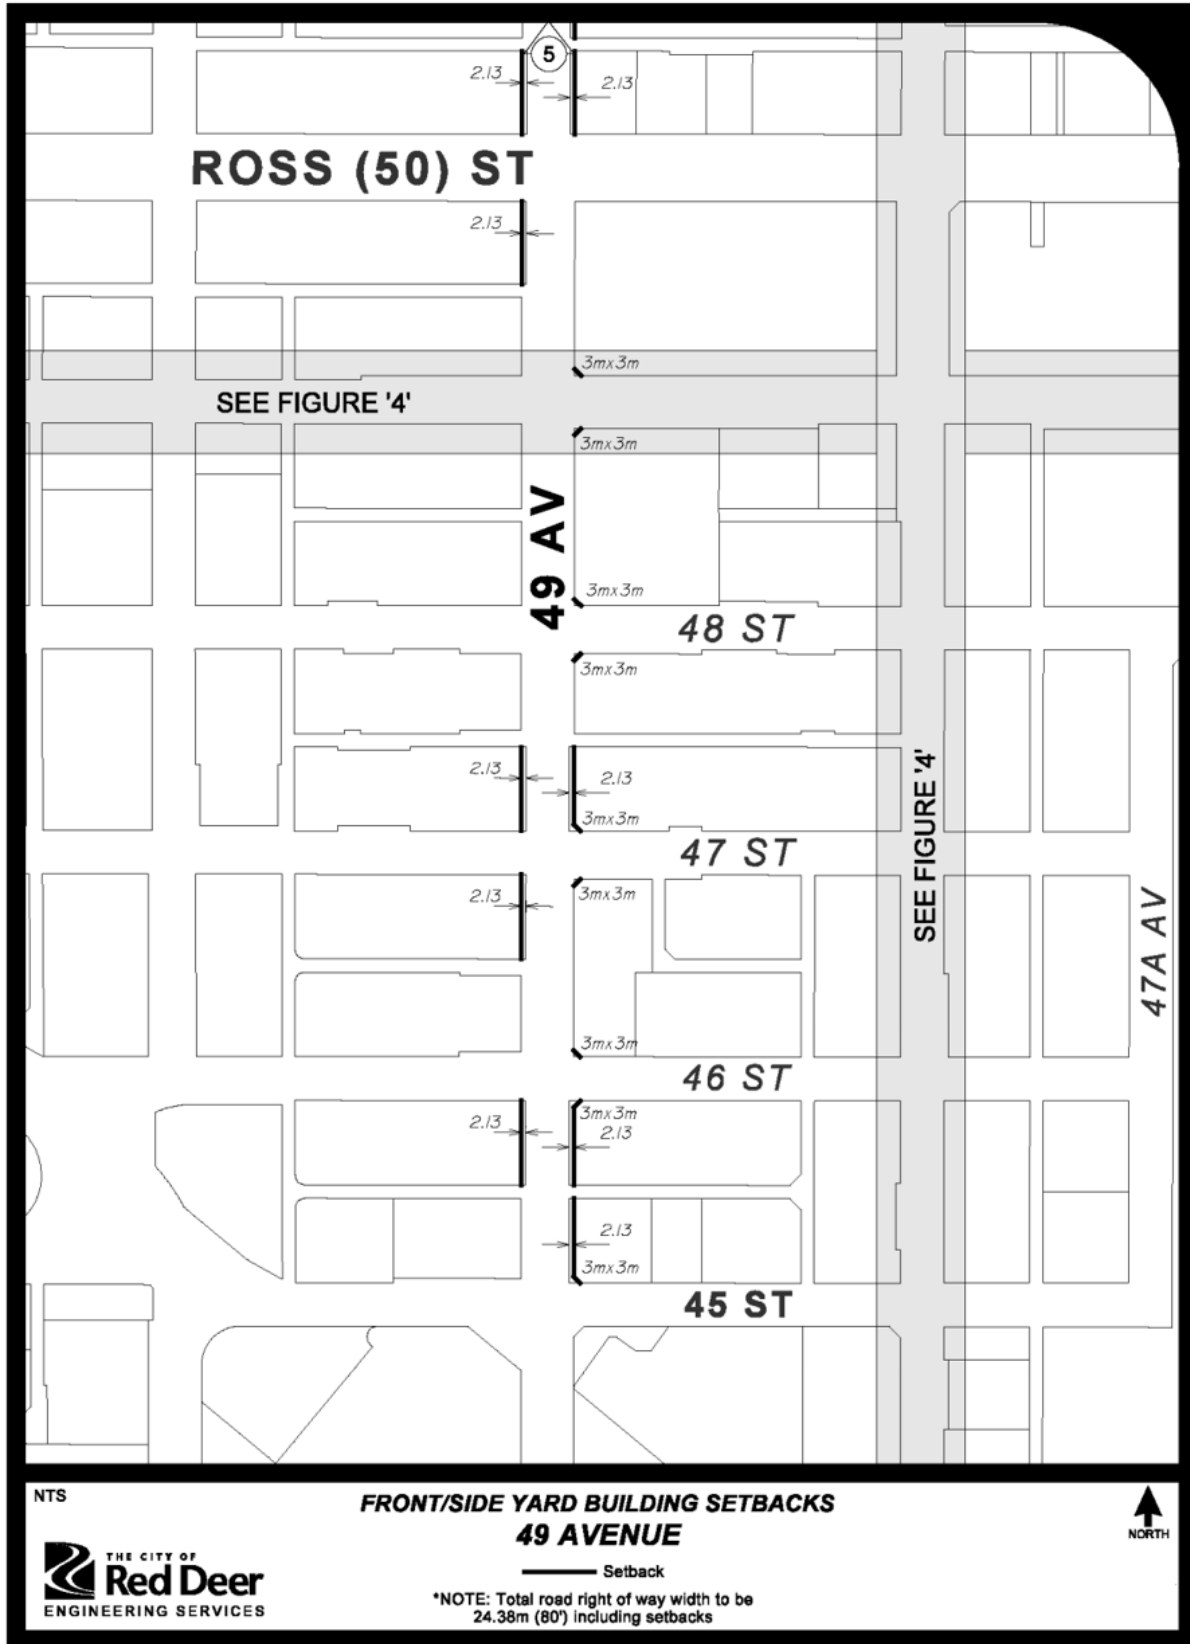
Front and Side Yard Building Setbacks - 49 Avenue
